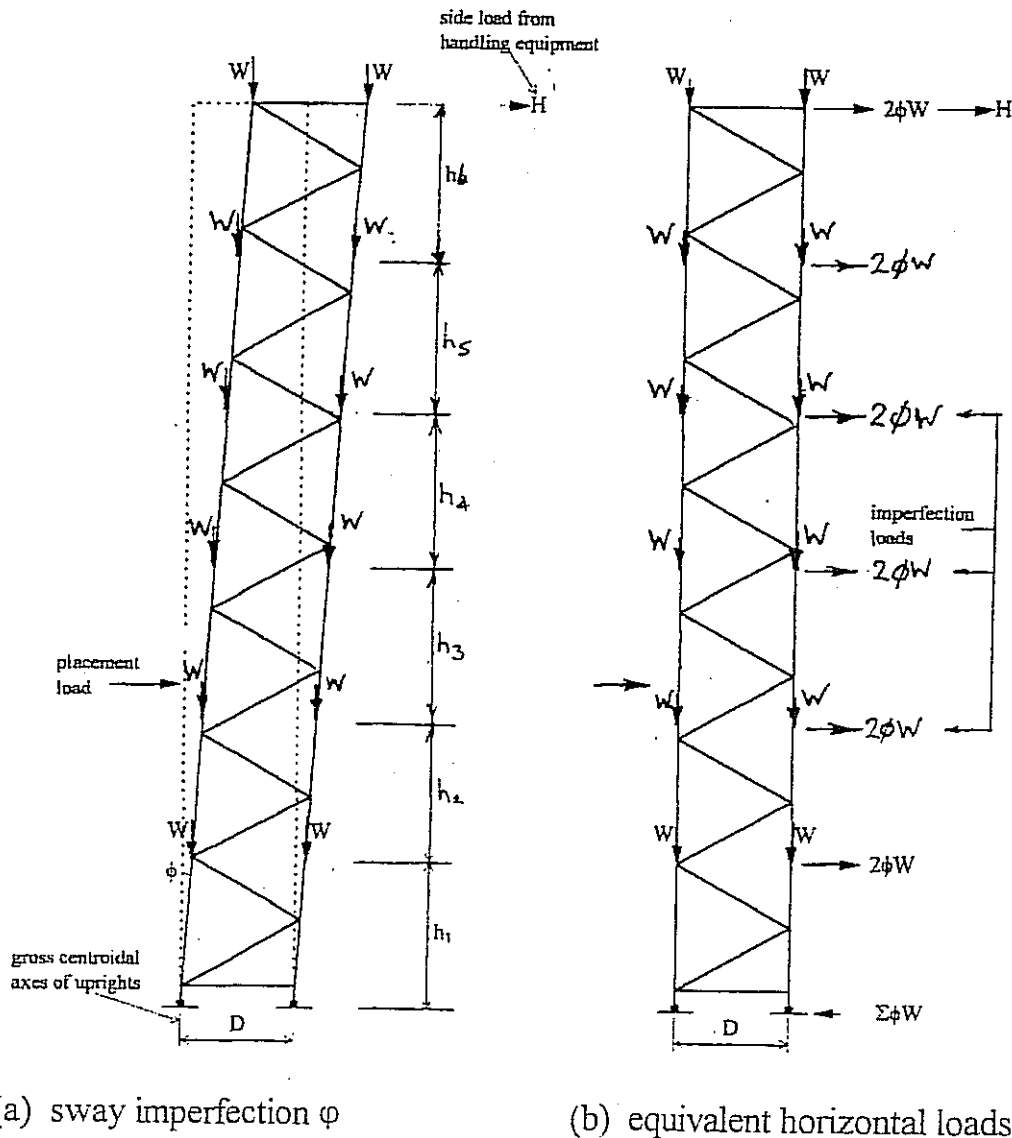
Structural models for the cross-aisle stability of braced frames
